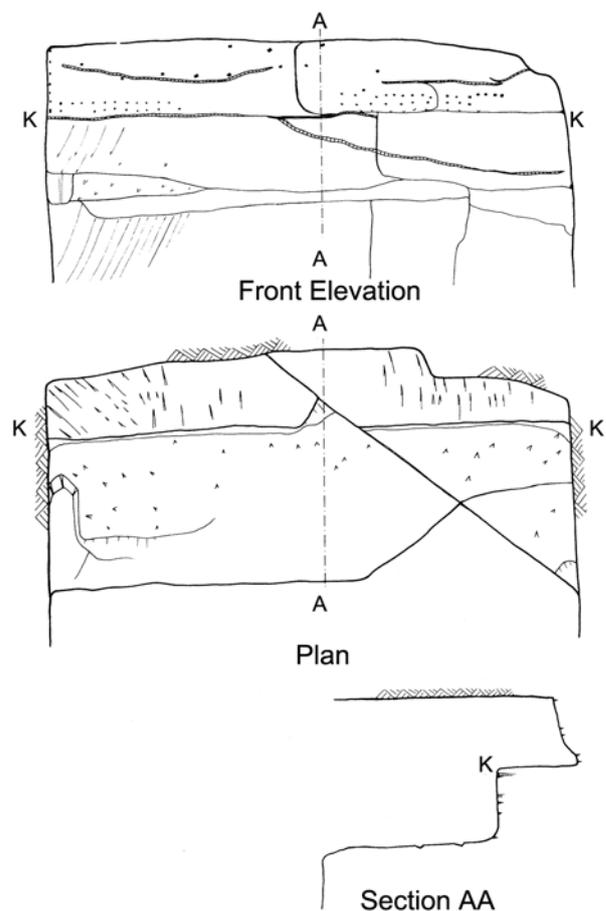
Front elevation, plan and section of the bench showing the chisel marks.
